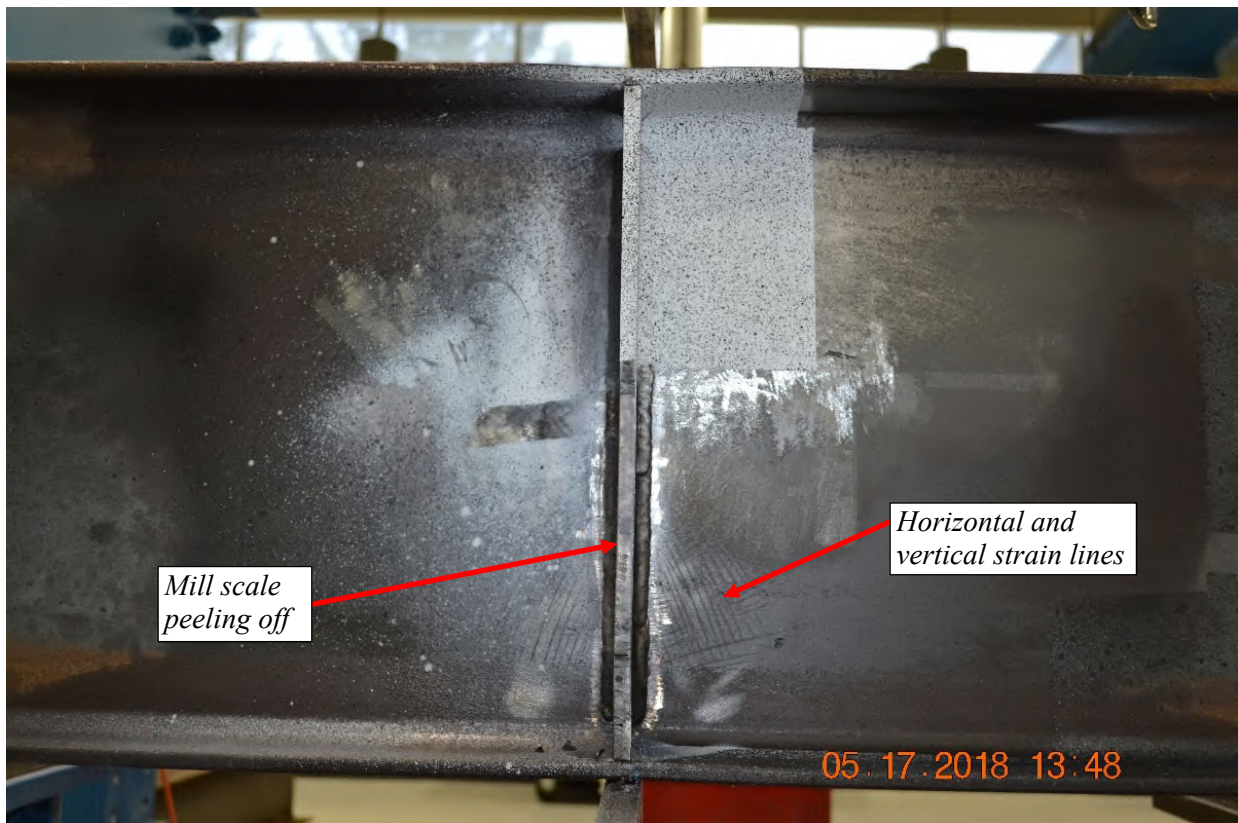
Bottom flange to stiffener weld condition after testing
